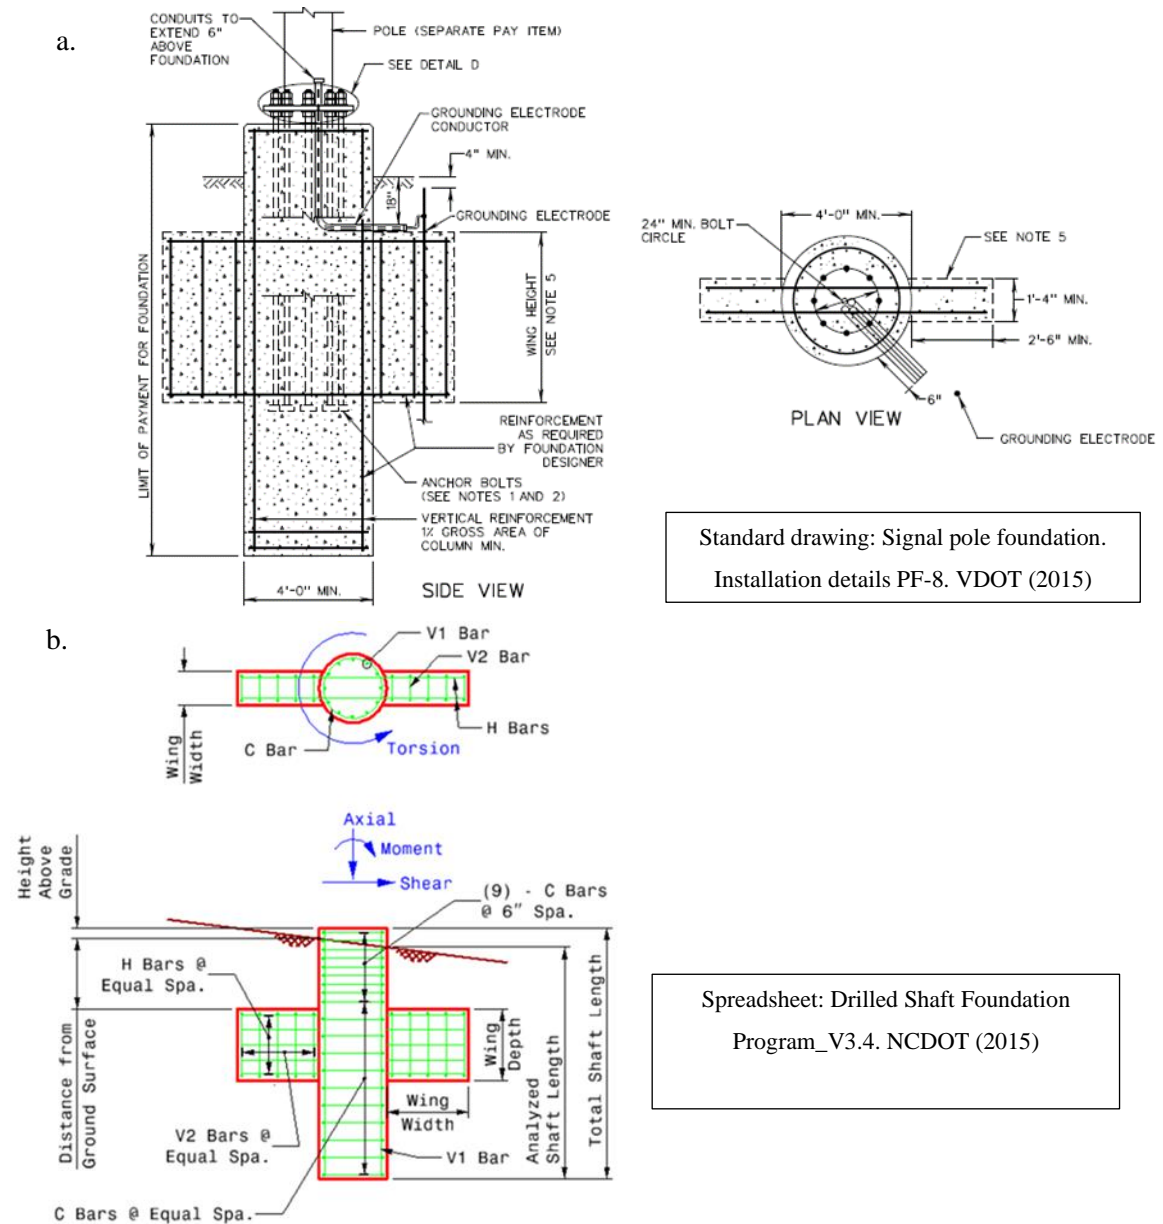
Examples design drawings for drilled shafts with wingwalls.
